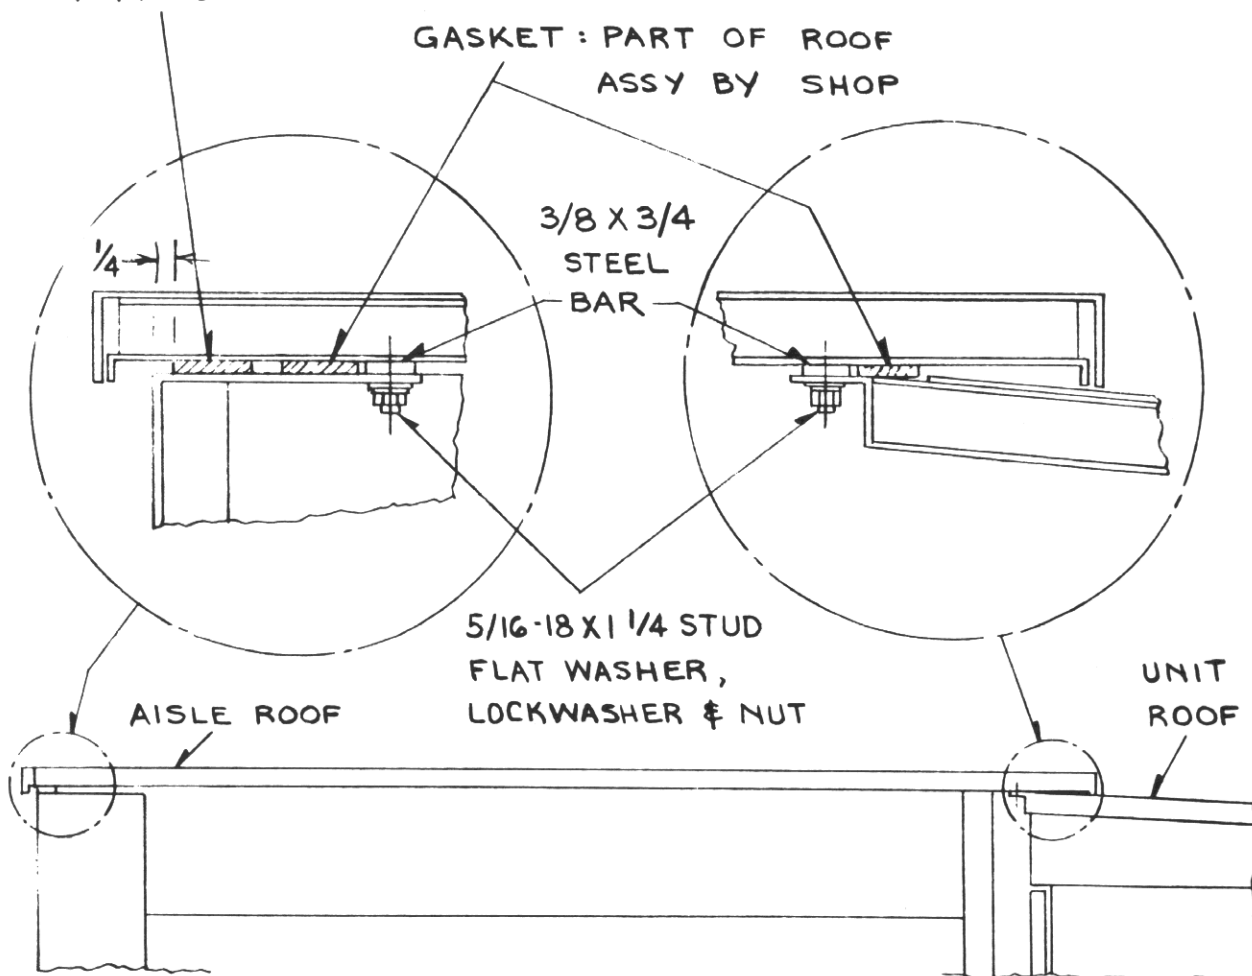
Roof Sheet Bolting Studs and Gaskets
